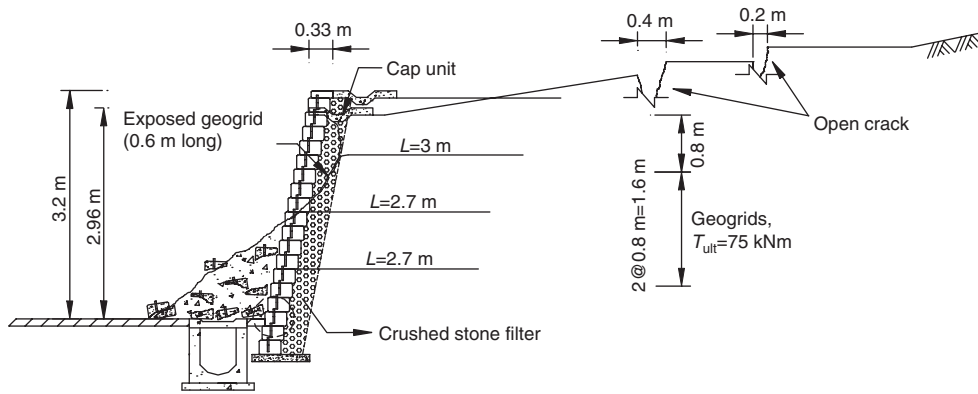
(a). Cross-section of failed GRS-MB wall and a nearby failed cantilever wall at site 2
